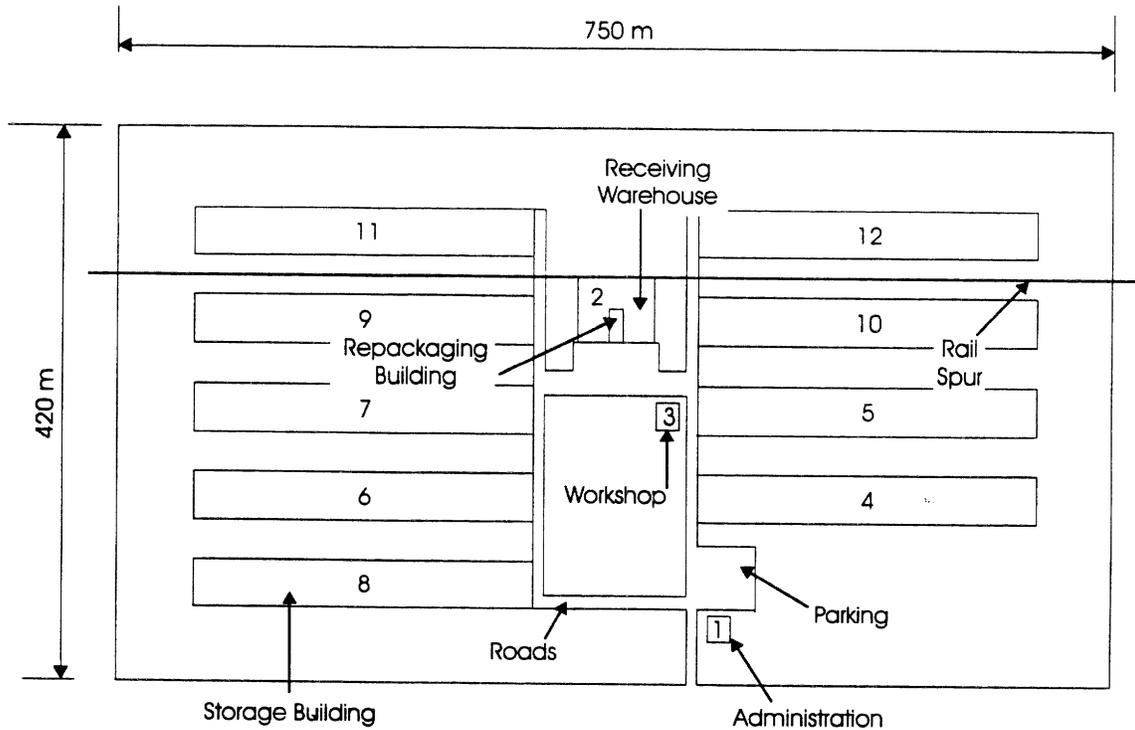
Site Layout, Building Storage Facility, UF₆, Base
